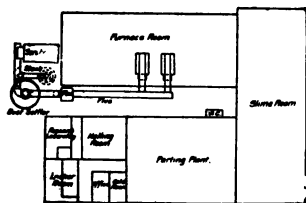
PLAN OF SILVER REFINERY. FIG. 67. SECTION THROUGH SCRUBBER.
